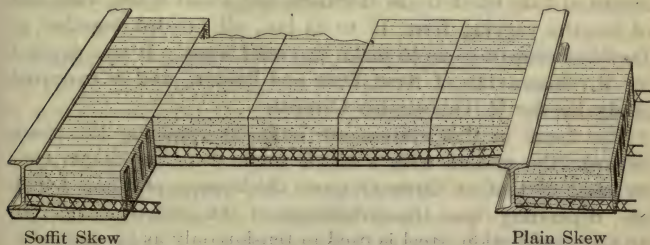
“New York” Reinforced Arch (Bevier Patent).
